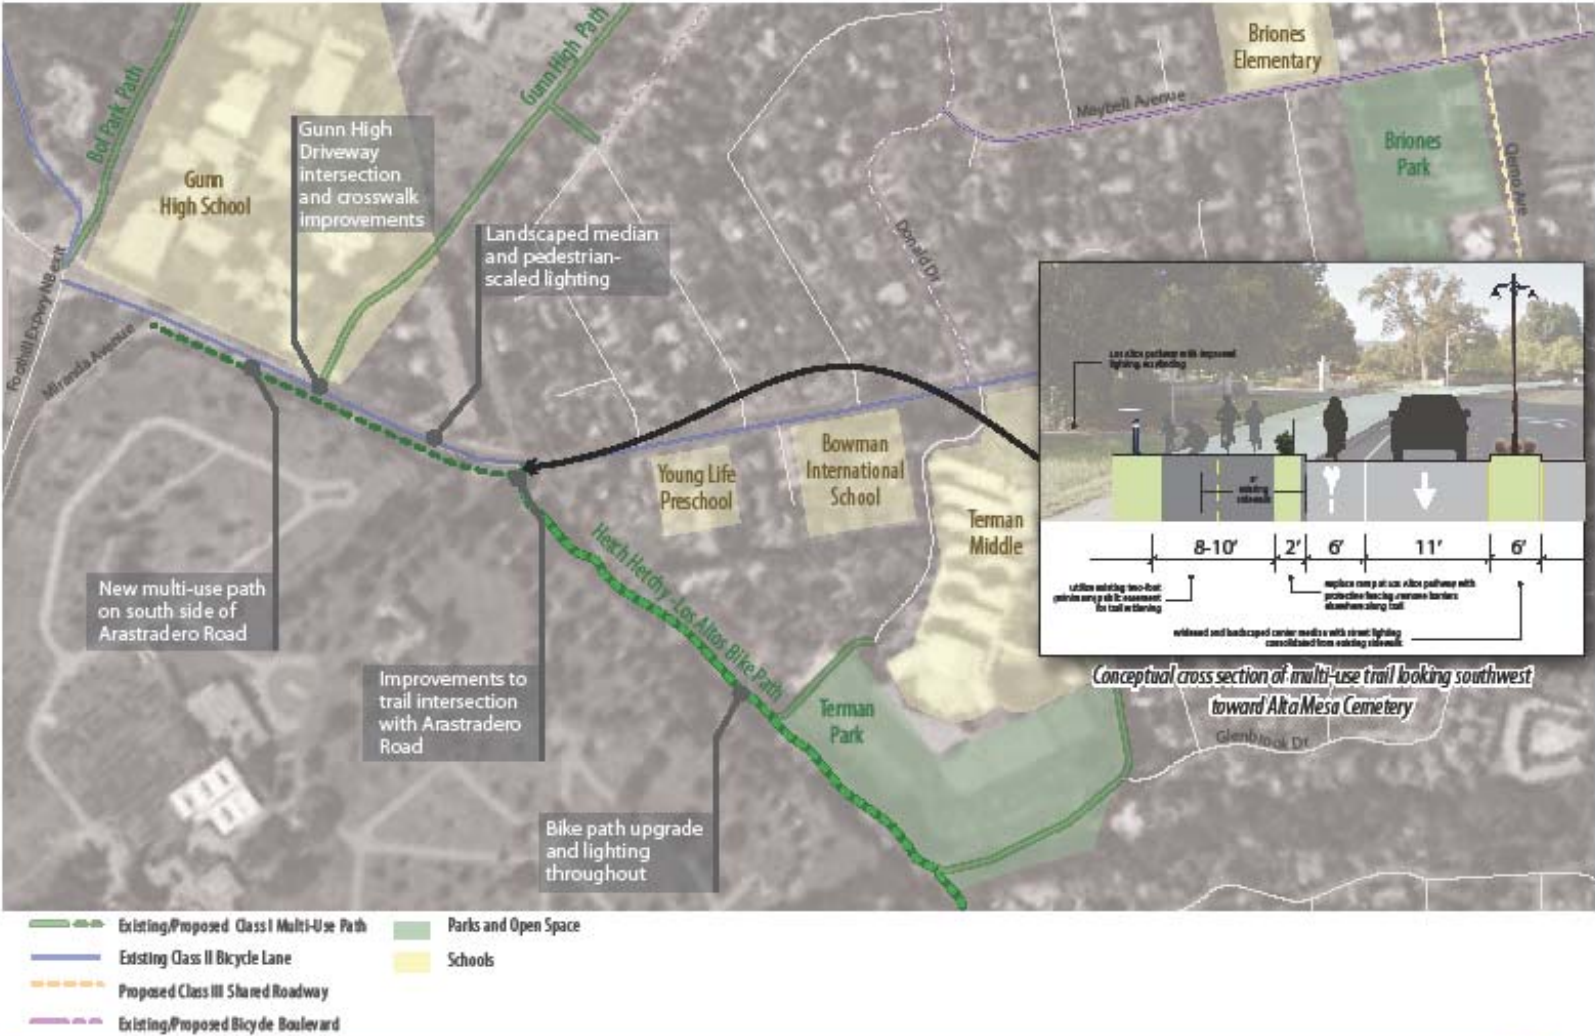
Arastradero Road Schoolscape - Multi-Use Trail
